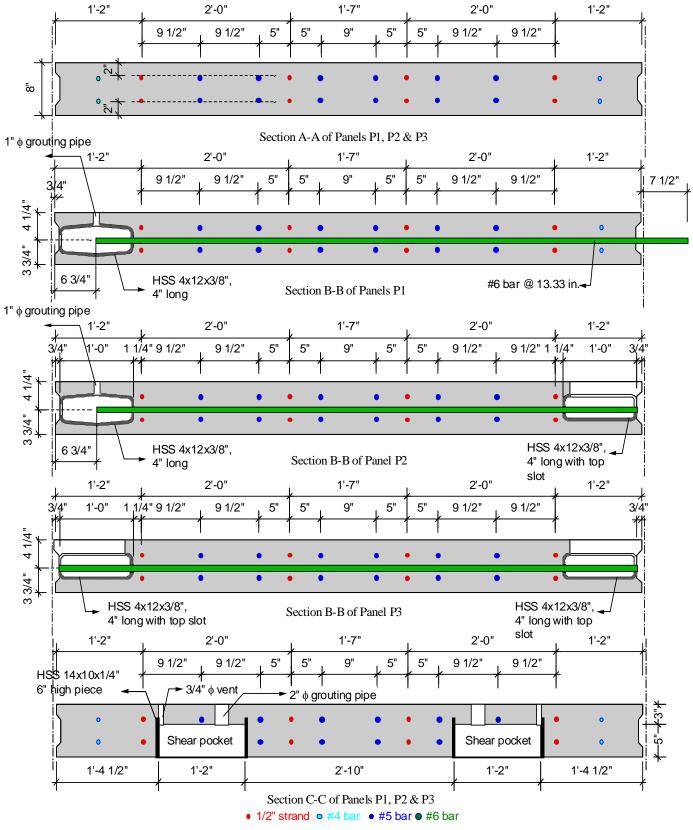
Sections A-A, B-B & C-C of Panels P1, P2 & P3
